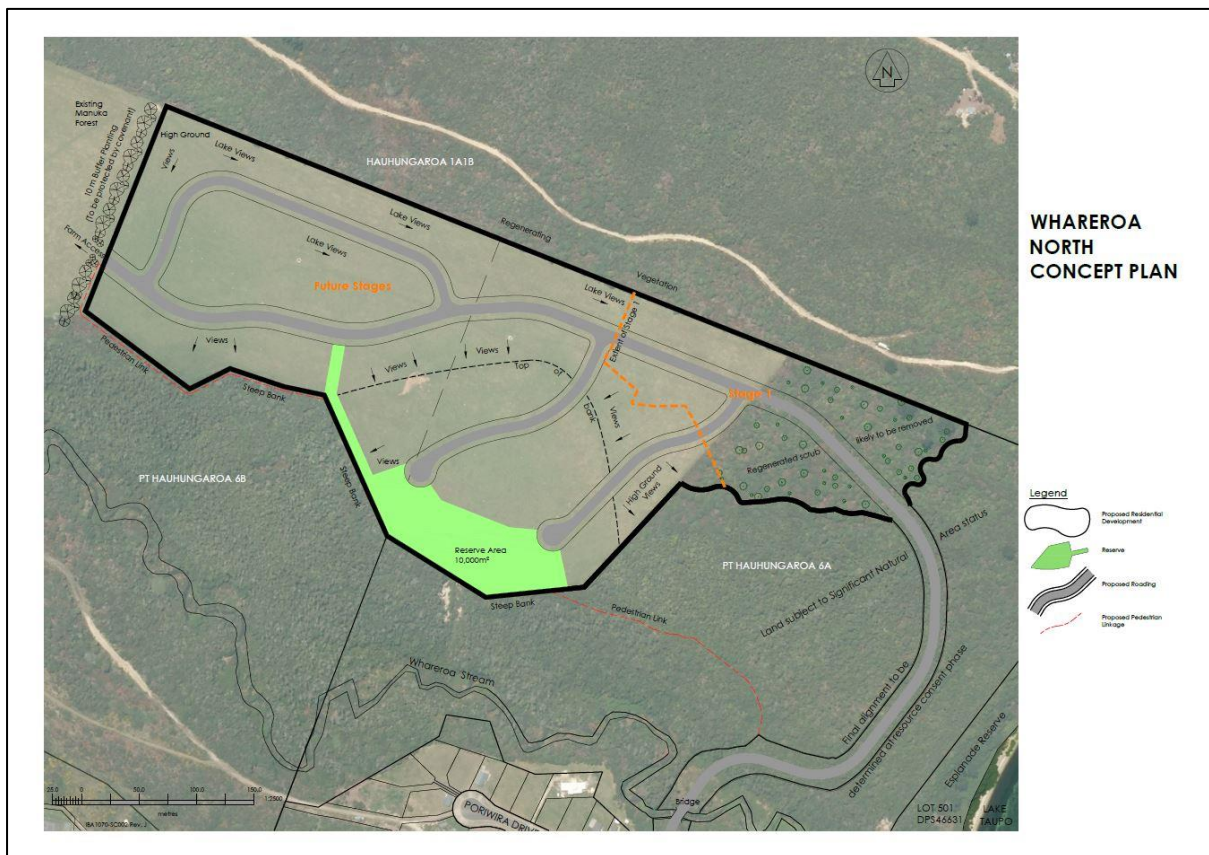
Whareroa North Concept Plan (Inserted District Plan: Appendix 8) – As Notified
